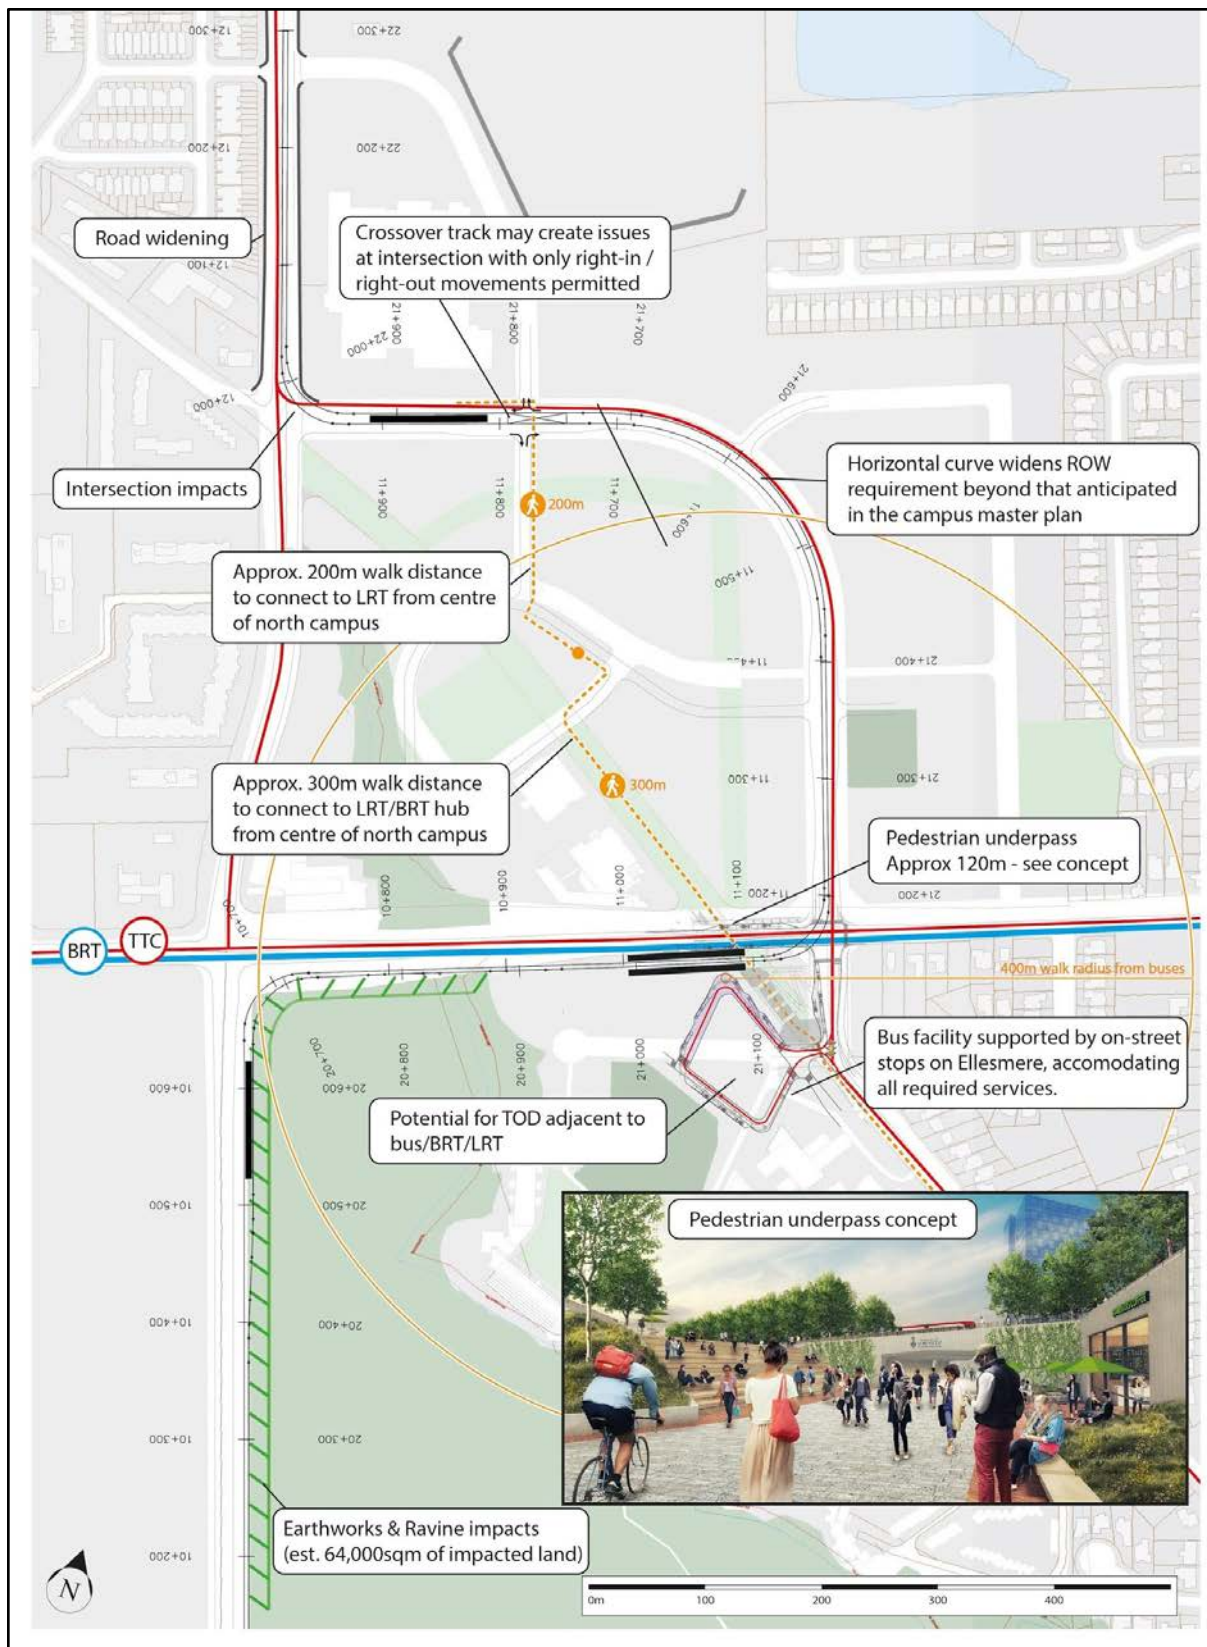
Enhanced at-grade concept (street and block pattern as articulated by the UTSC proposed Secondary Plan)
